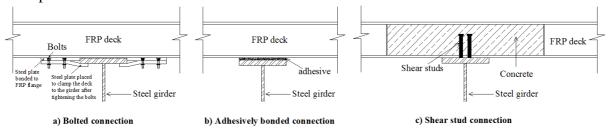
Concepts of FRP deck – steel girder connections: a) bolted connection b) adhesively bonded connection c) shear stud connection
